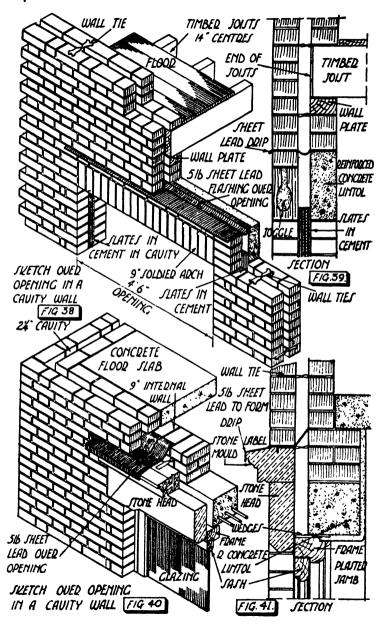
and 41 illustrate the construction of a stone head surmounted by a stone moulding or label course.
